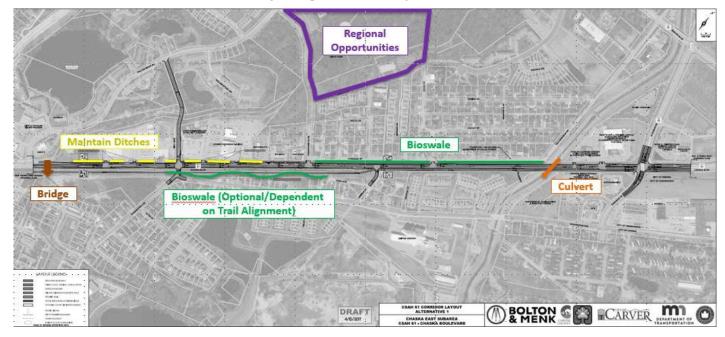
East Chaska Area preliminary stormwater management exhibit. BMPs identified above are conceptual only. Sizes and locations of BMPs shall be further refined under future preliminary road way improvement and construction planning phases.
